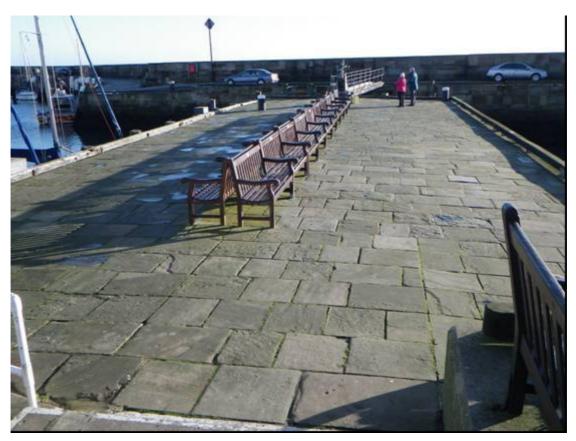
Vincent's Pier, general view of south section of Lighthouse Pier showing stone surface, looking east
